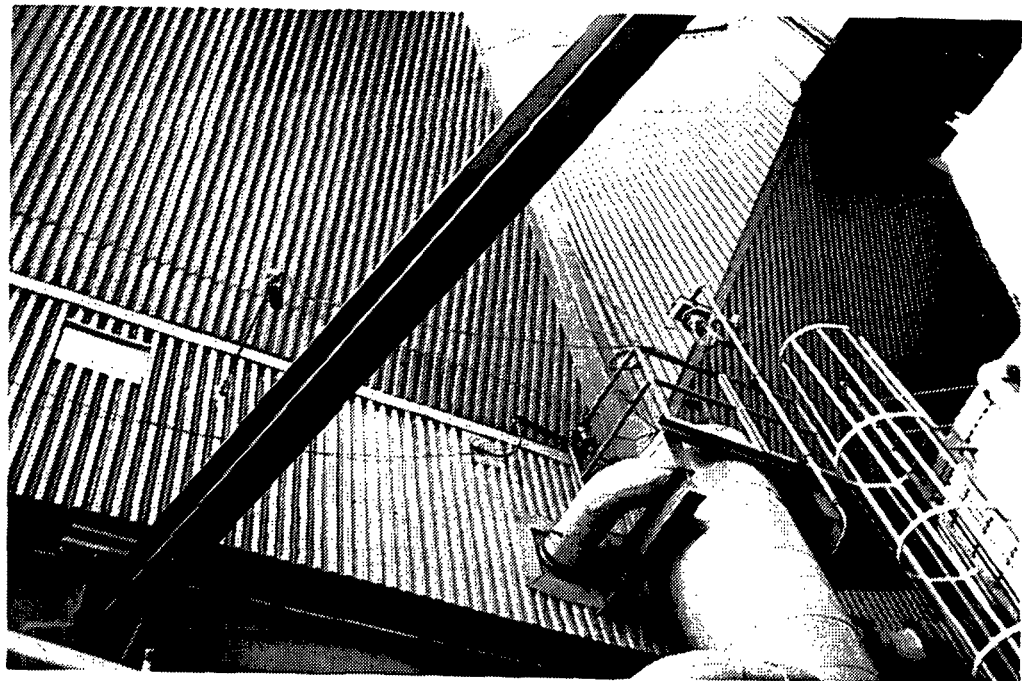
A view looking upward at the north wall of the No. 3 precipitator. Probes can be seen installed along the lower area of the wall, below the outlet ductwork.
